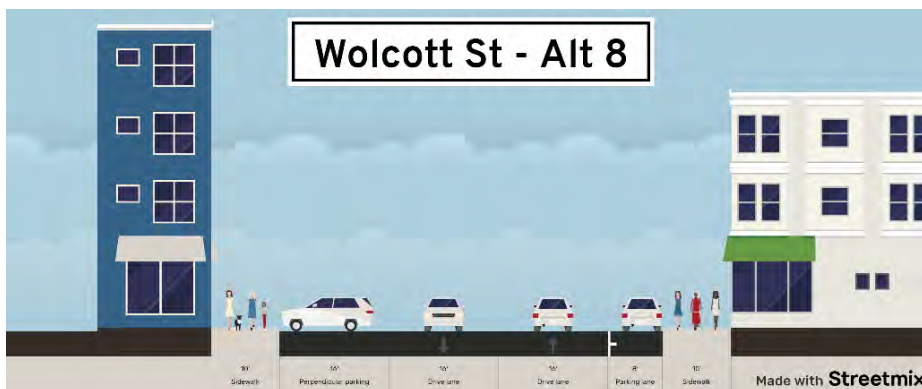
WOLCOTT ST ALTERNATIVE 8 PROPOSED CROSS SECTION
